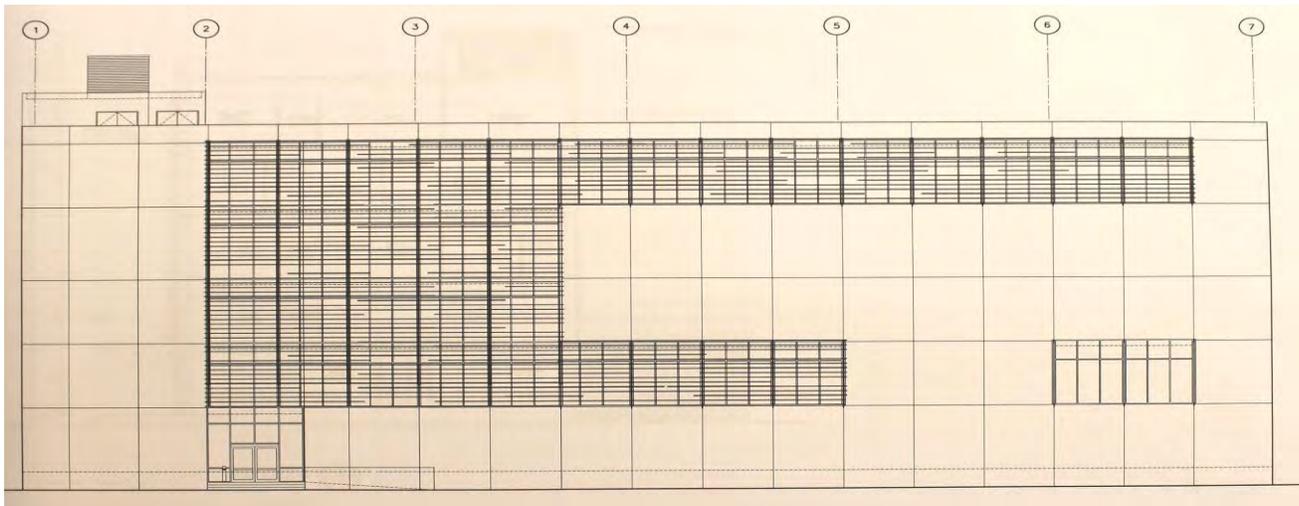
Architect's supplied drawing sheet: north elevation for the new Criminal Evidence and Processing Complex located at 2761 Gravier Street, New Orleans, LA.
